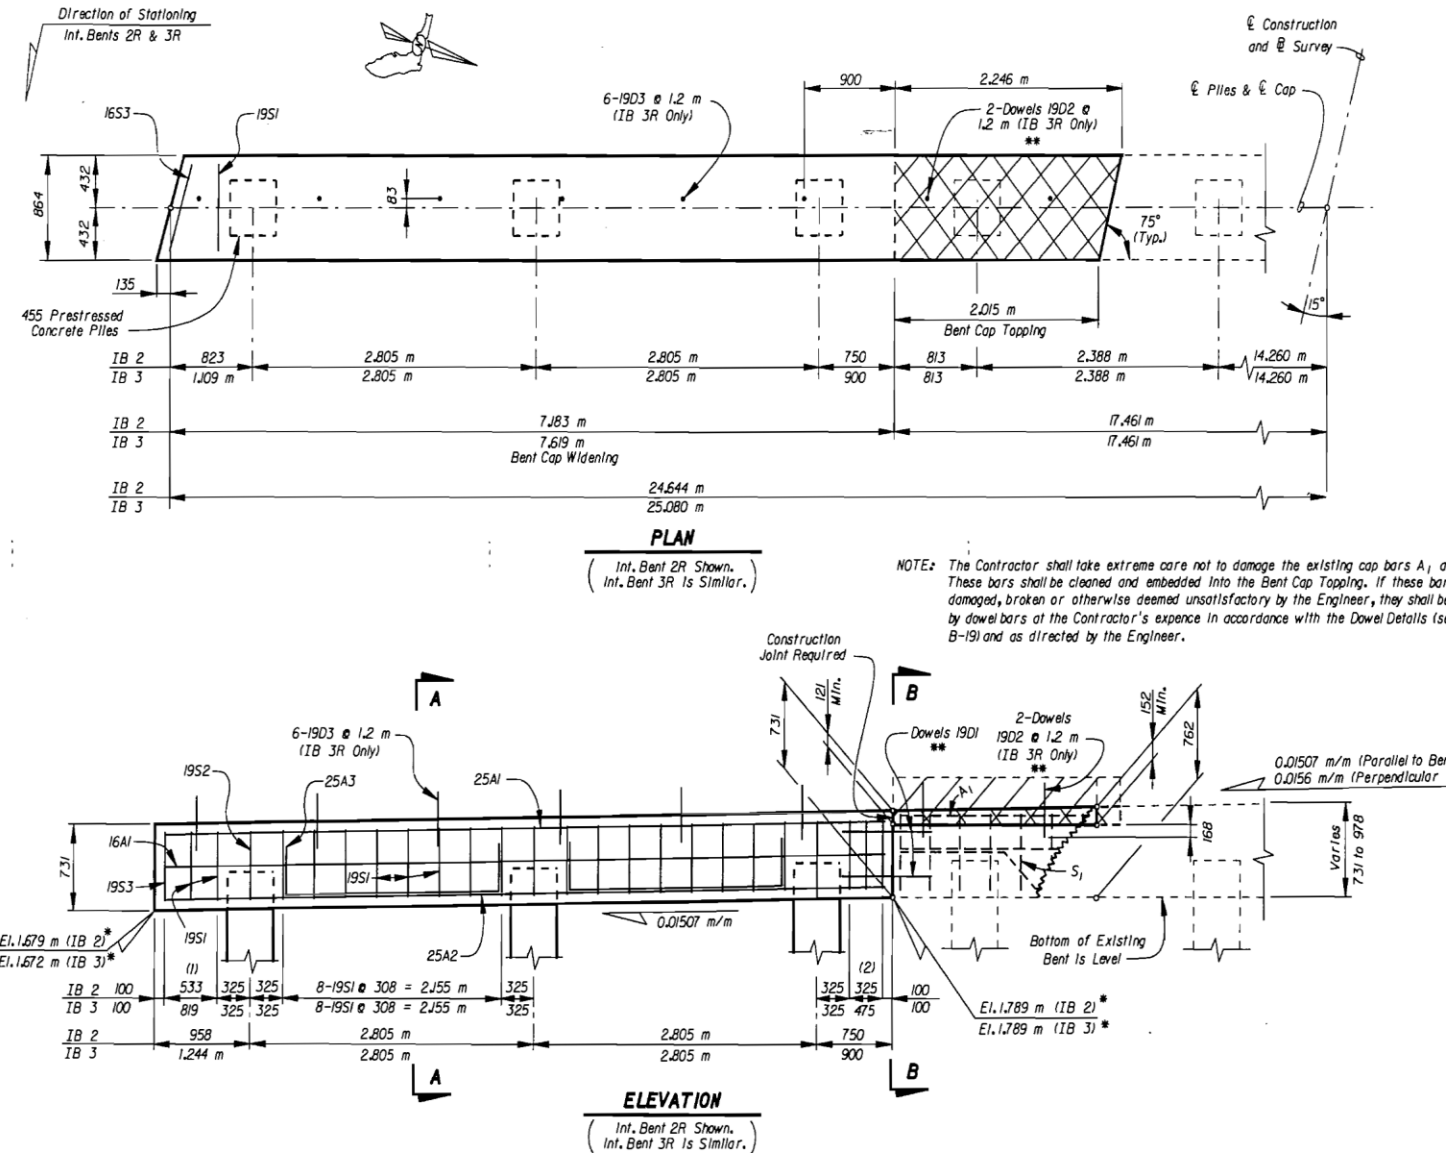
Plan and Elevation of Intermediate Pier of Bridge No. 860139 from 2002 Bridge Widening Plan Set (Page 36 of 52)
